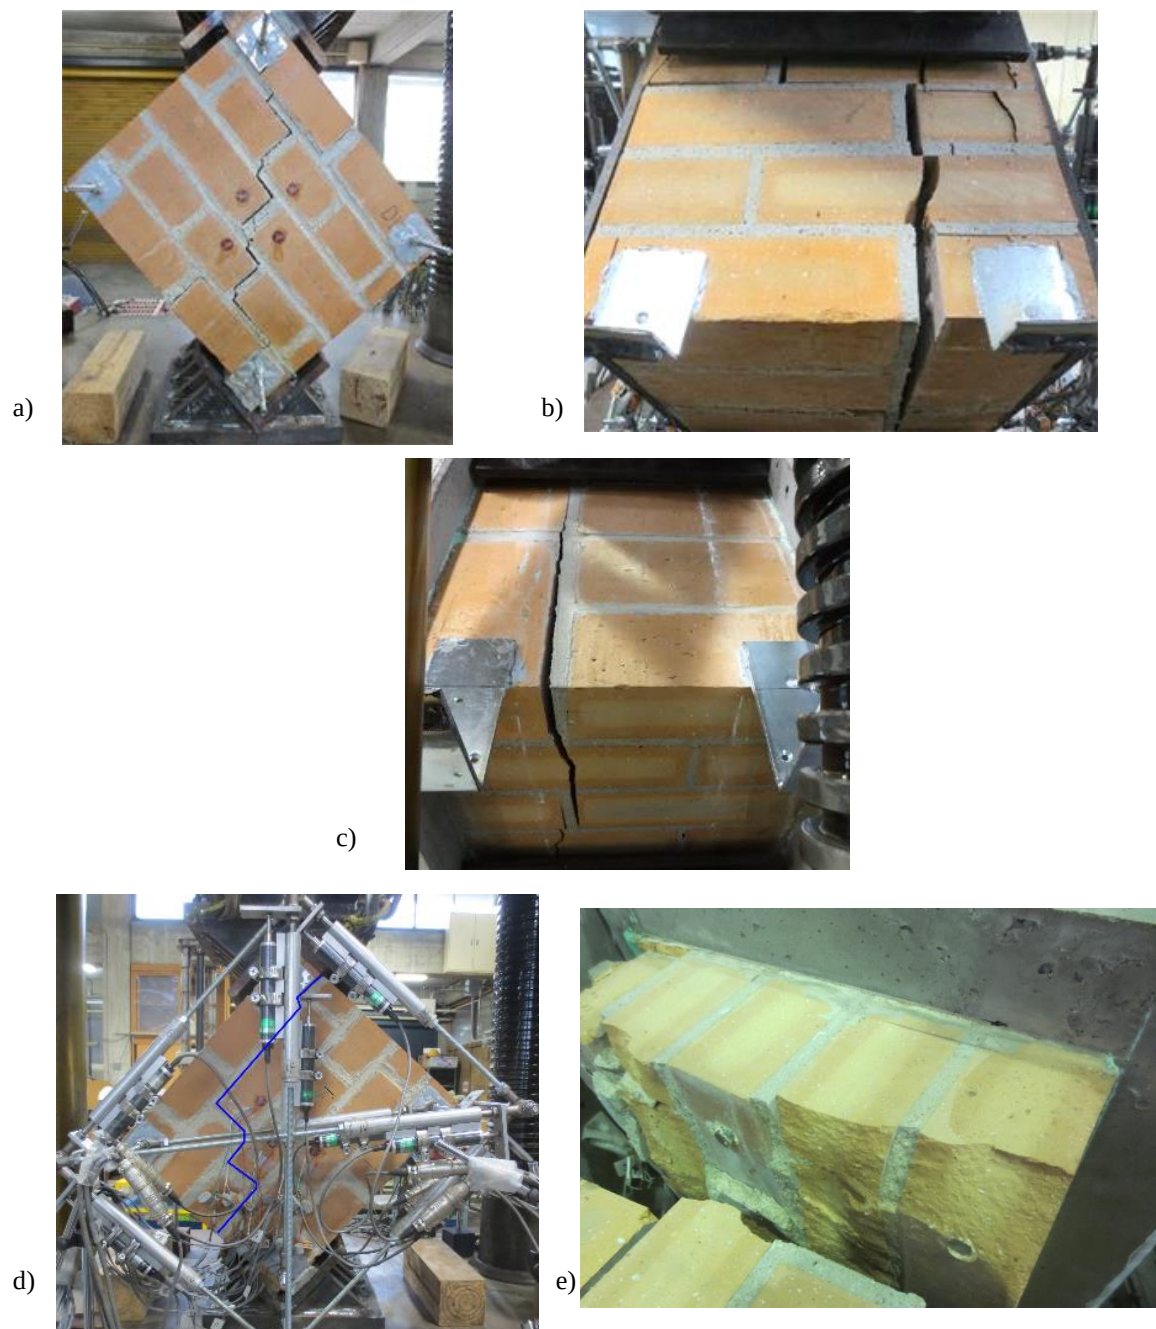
a) Shear failure in DUR specimen (DUR503), b) Splitting failure in DSD specimen (DSD 510), c) Splitting failure in DCD specimen, d) Shear failure observed in DSS, DCS (unreinforced side DSS508), e) Splitting of masonry at the tip of embedded anchor in DCD specimens
